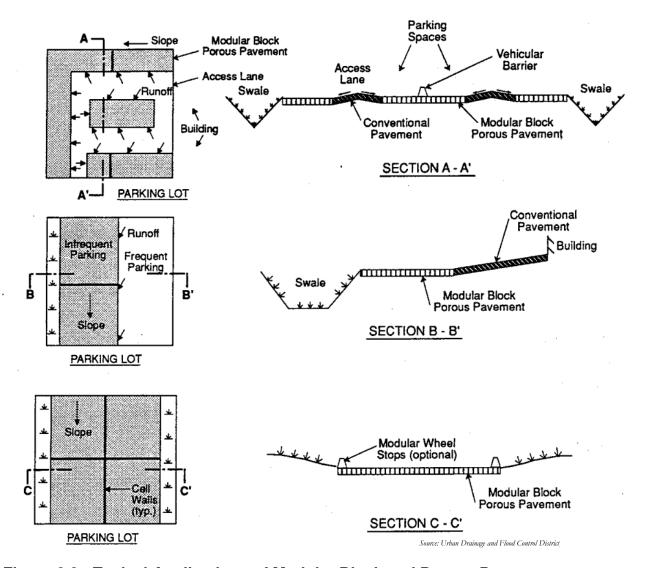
Typical Applications of Modular Block and Porous Pavement
